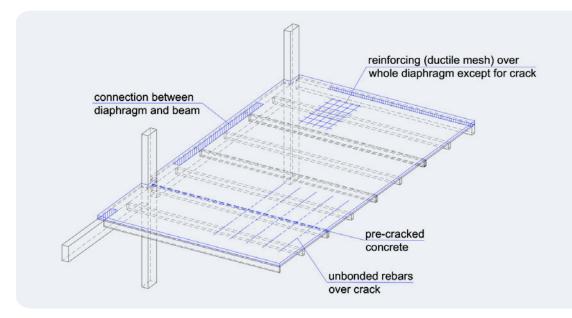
Suggested detailing for a TCC floor in a frame system.
